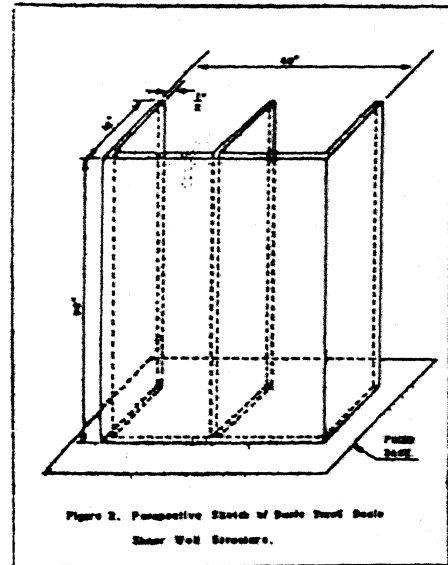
Perspective Sketch of Single Story Single Shear Wall Structure.
